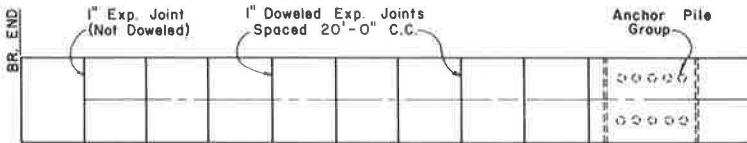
Typical plan of jointed slabs at pavement ends (De Soto County).
